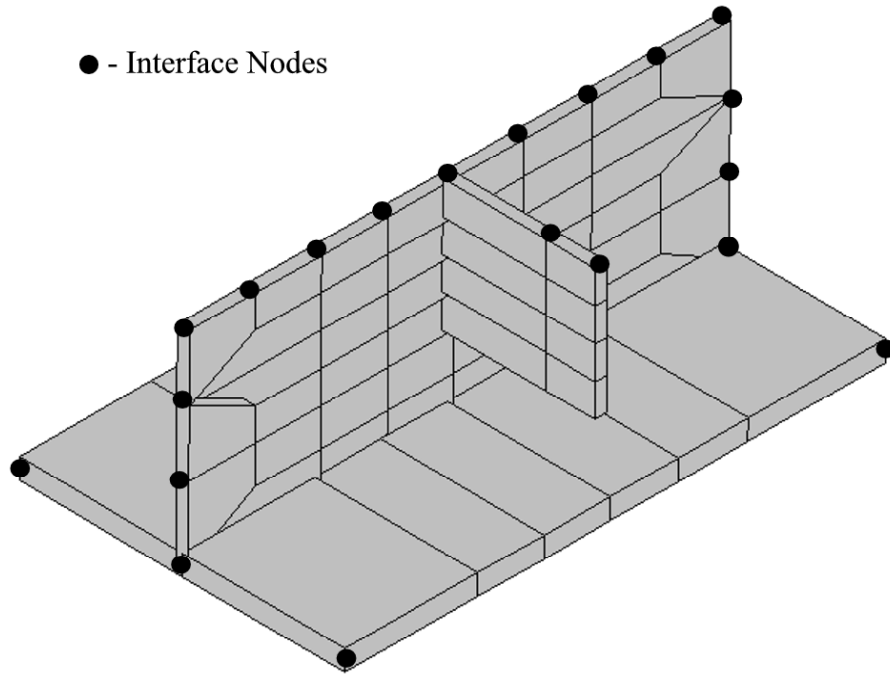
Partial Elevation of Typical Test Specimen Model
